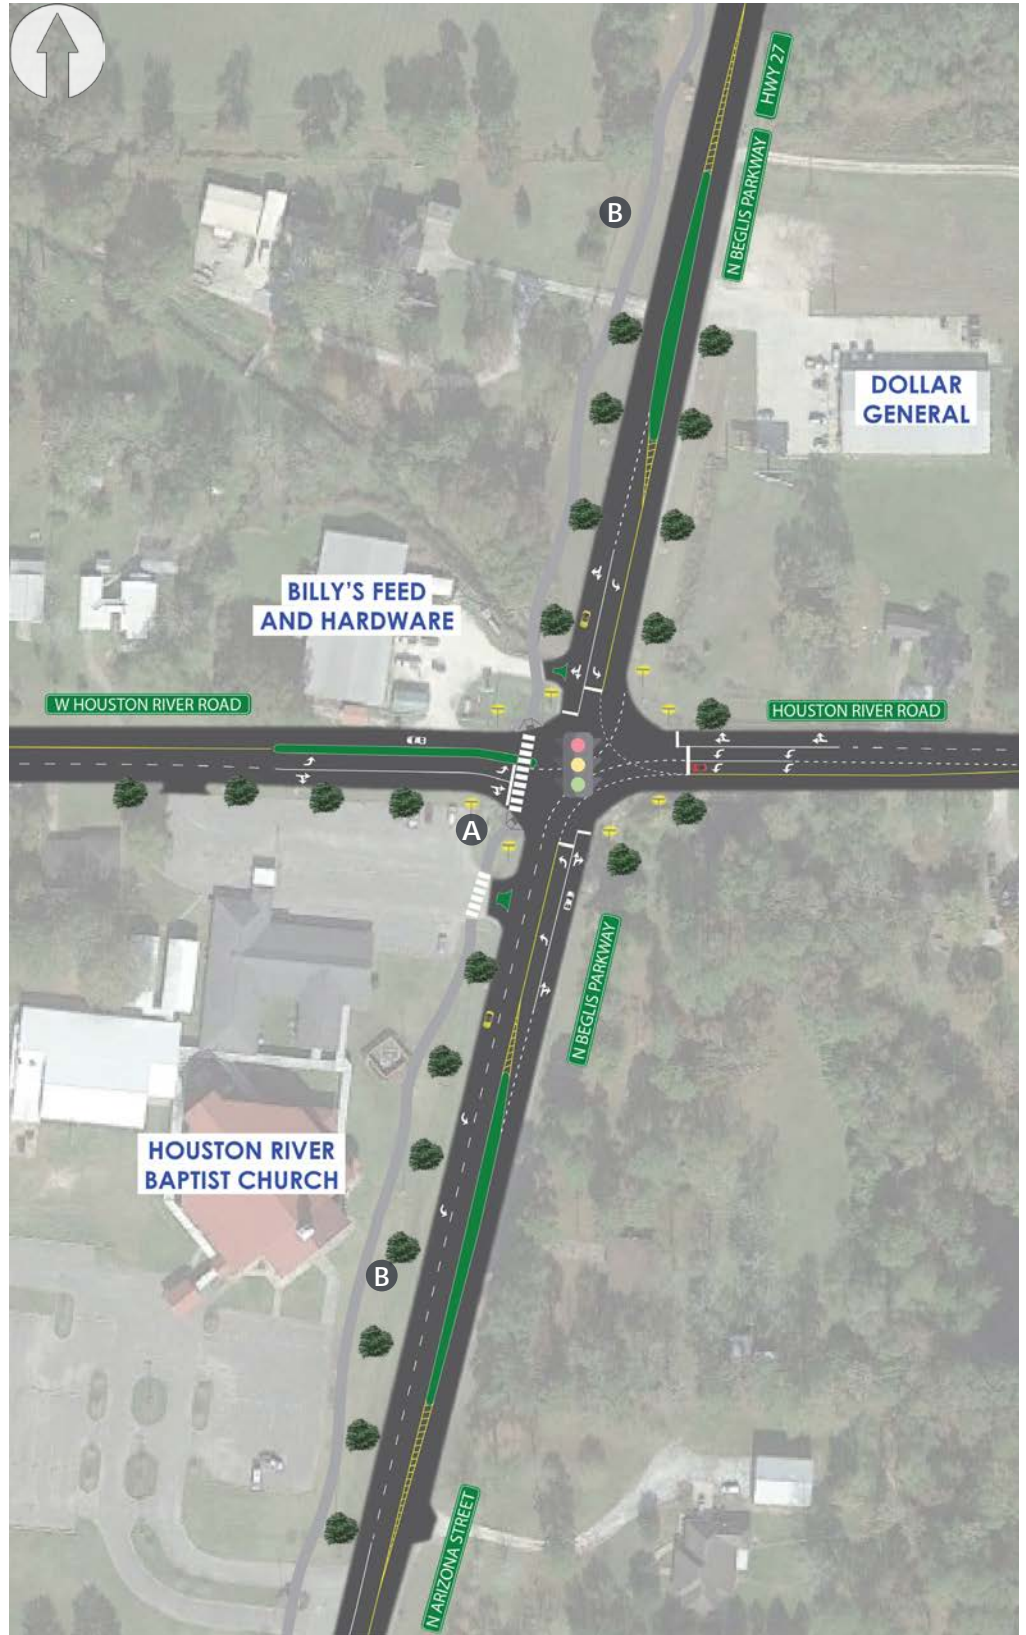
| Beglis Pkwy and West Houston River Rd Proposed Improvements
